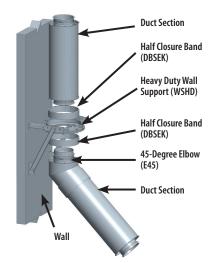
Elbow with an Heavy Duty Wall Support (HOWS)
